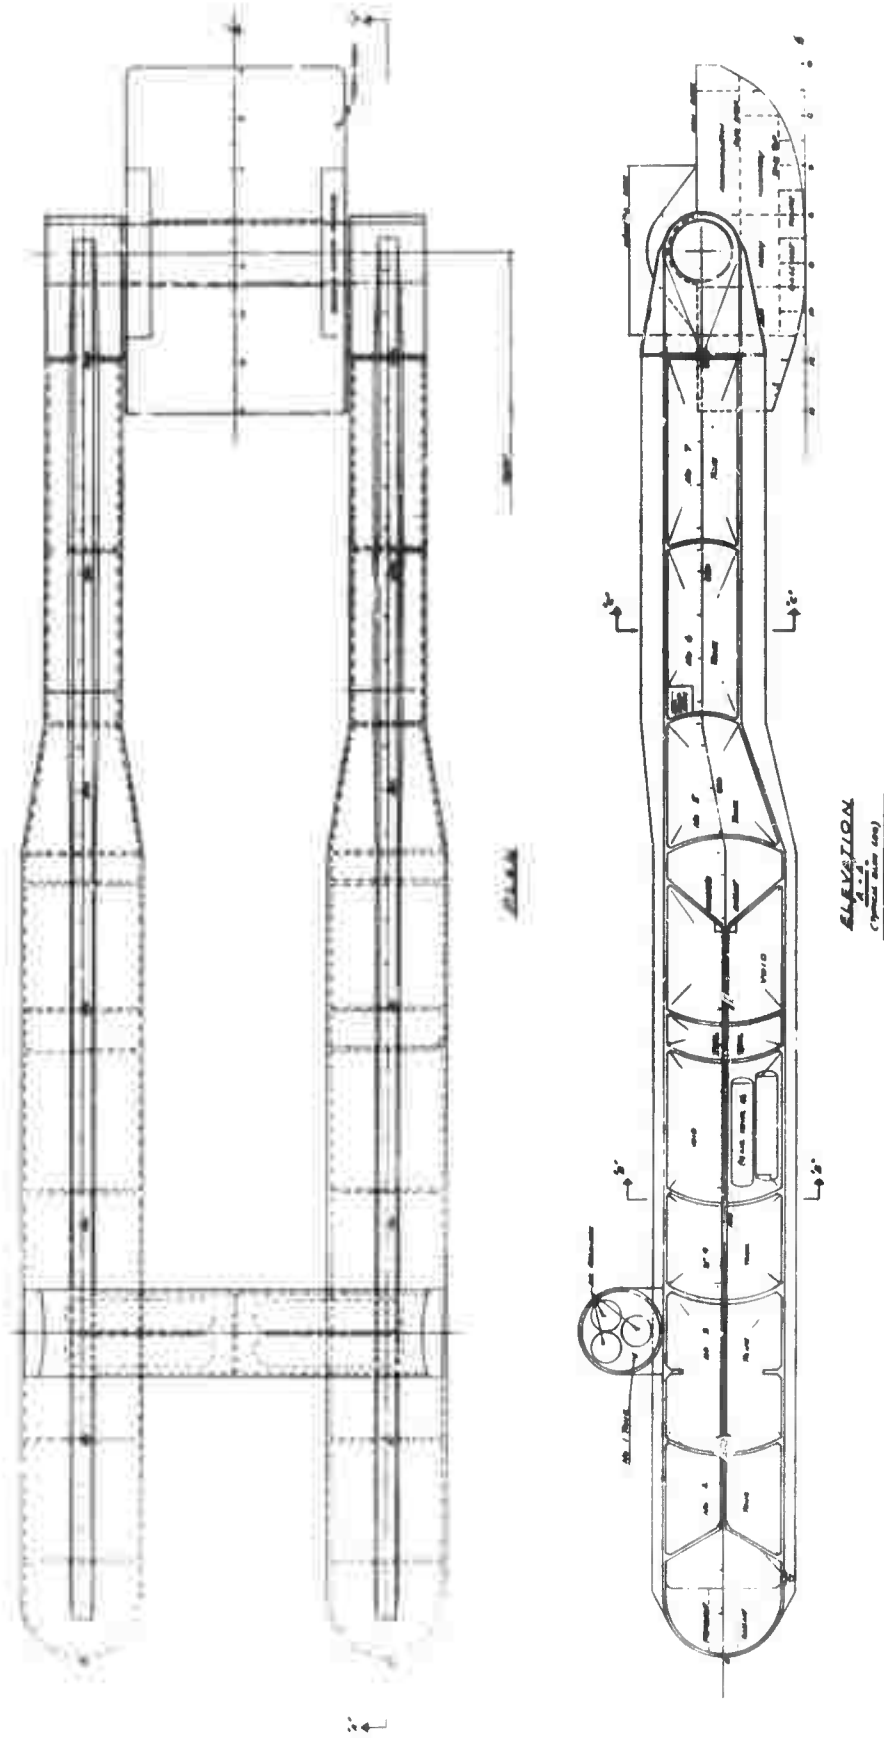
Engineering Drawing of Single Stable Floating Platform Module Showing Major Component and Bulkhead Arrangements
